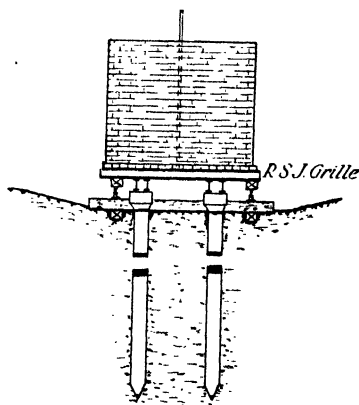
Concrete Group Pile Test, Steel Platform.
